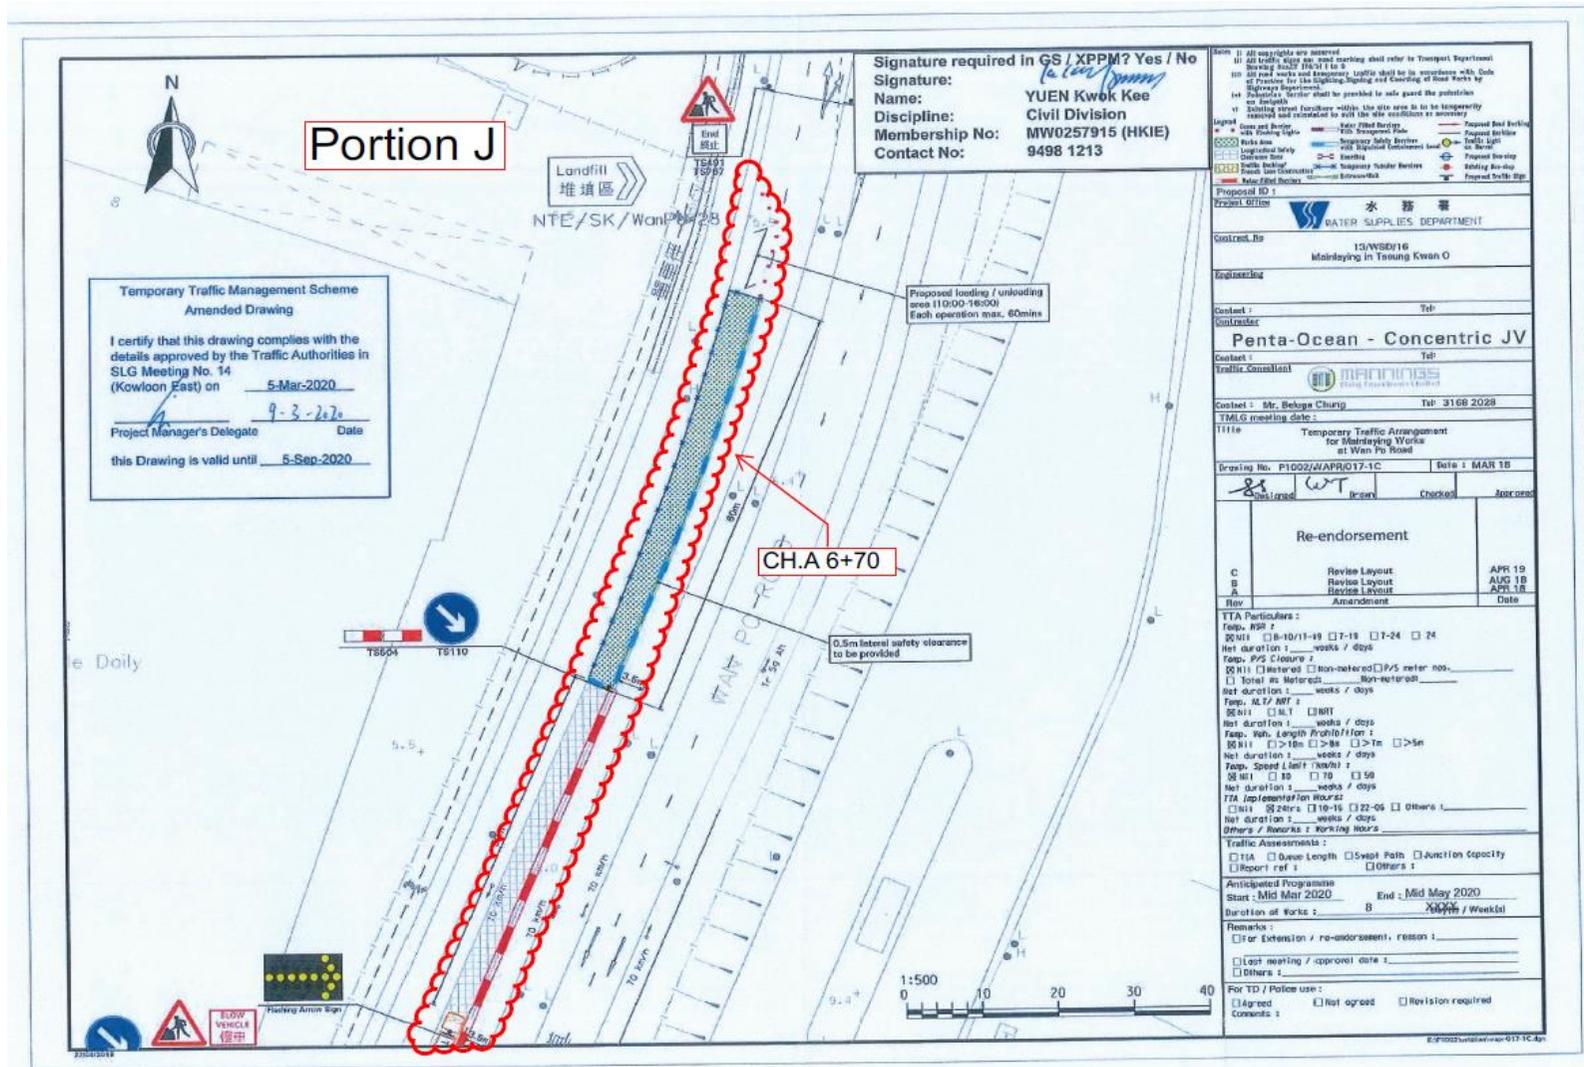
(i). Location Plan for Portion J - CH.A 6+70
